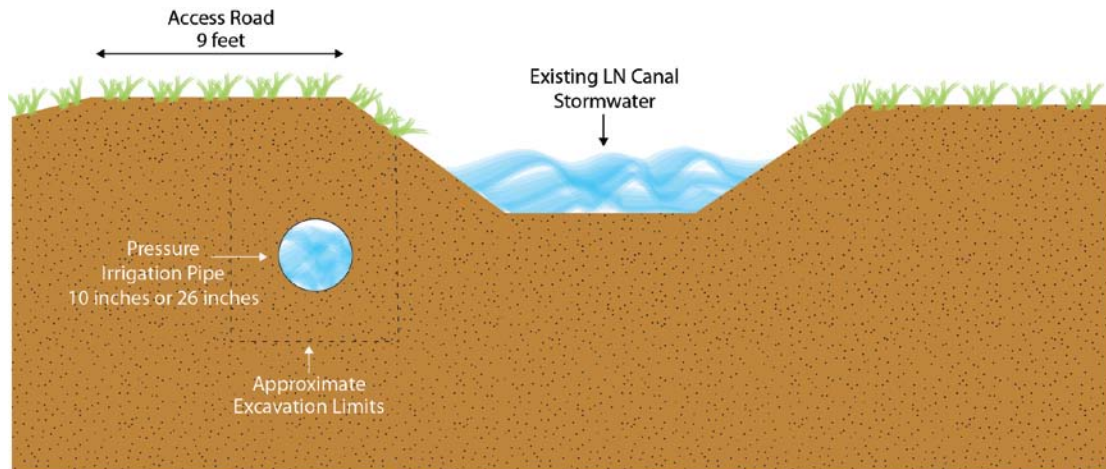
Typical Cross-Section C: Pressure pipe in LN Canal (looking downstream)
